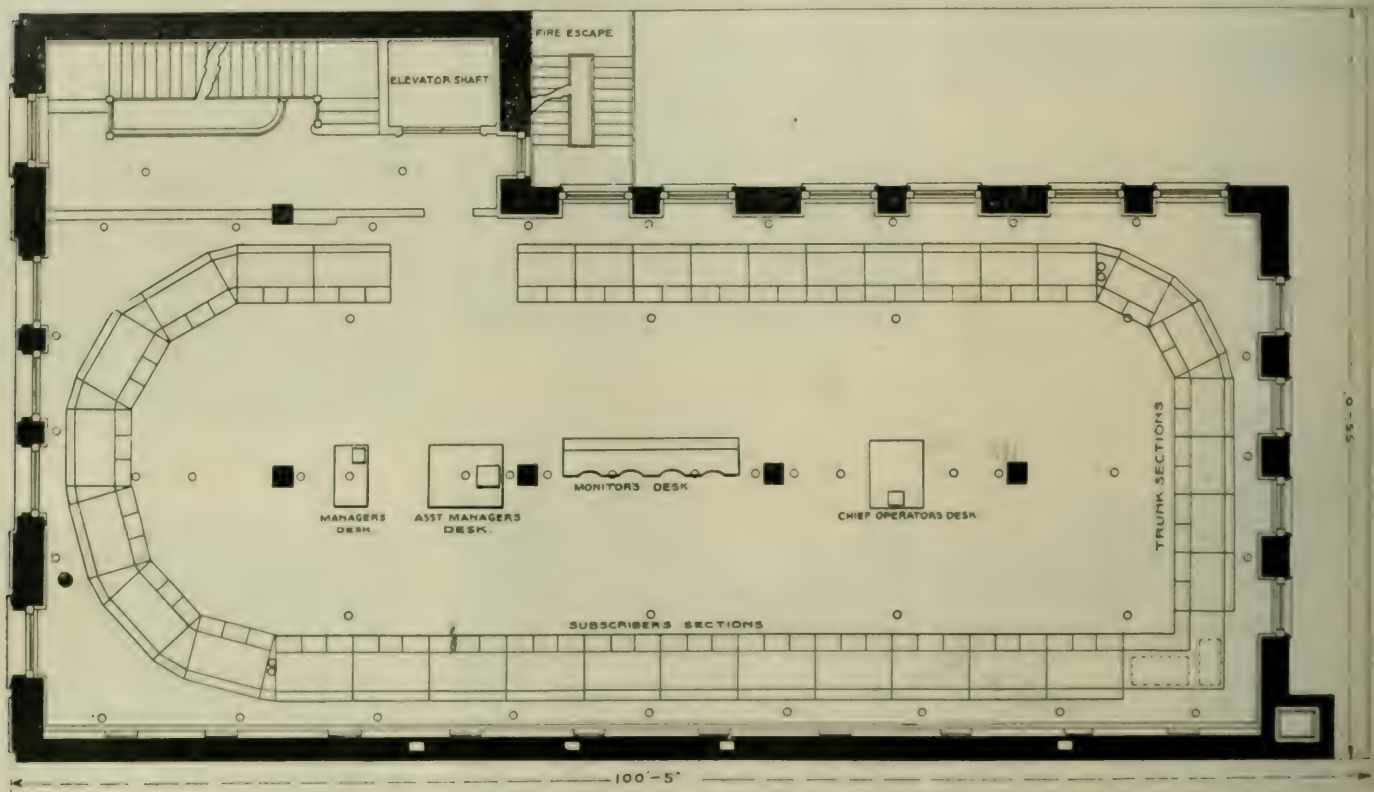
FOURTH FLOOR PLAN, PLAZA CENTRAL OFFICE.
